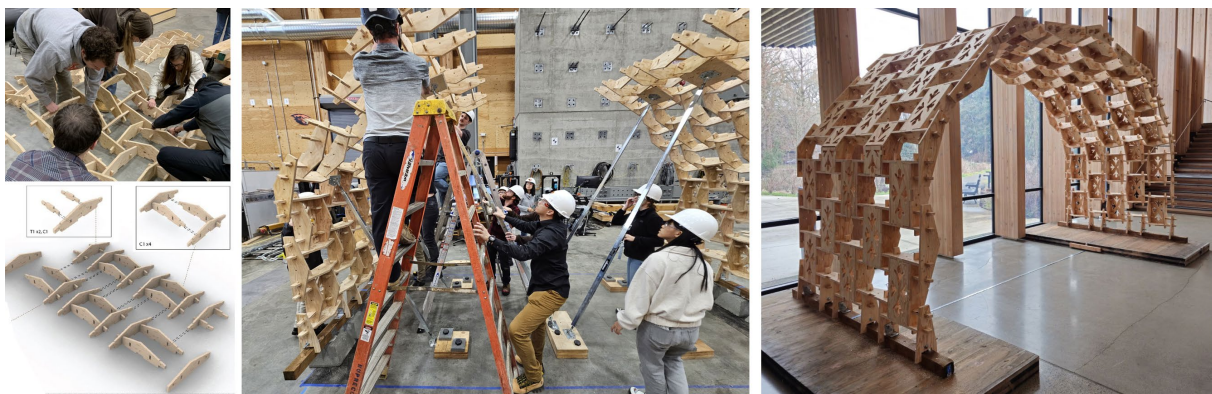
Module construction with concurrent sliding notches (l), first assembly (m) and second assembly (r)
